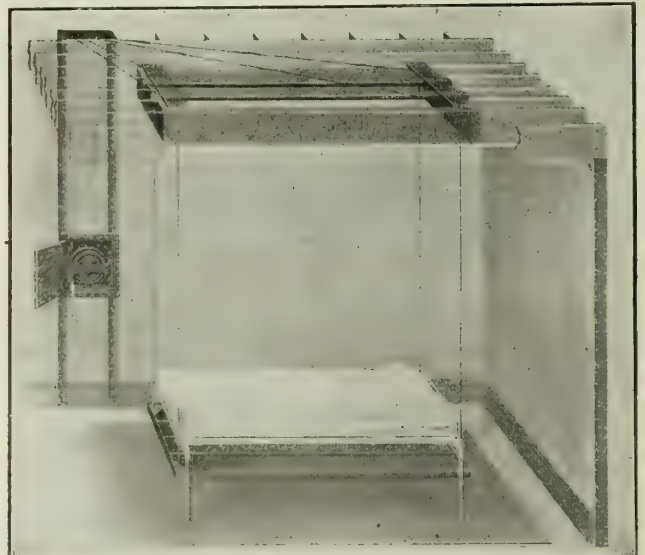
INSTALLATION OF BED WHERE CHANNEL IRONS ARE USED TO SUPPORT FLOOR ABOVE BED
